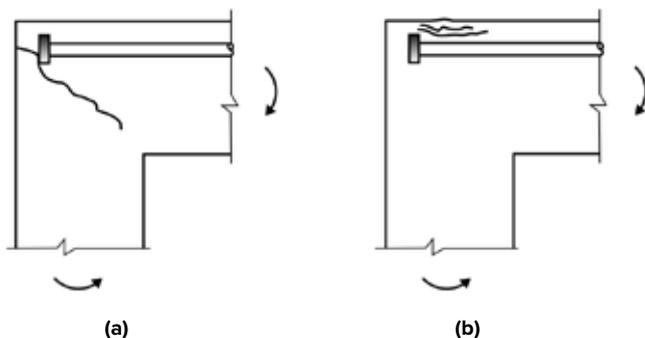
Potential failure modes for a knee joint with headed top reinforcement: (a) diagonal cracking; and (b) top face blowout
